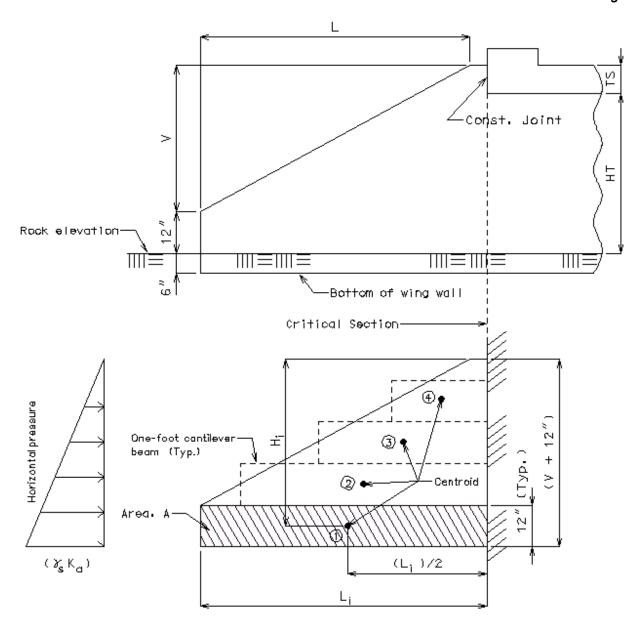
Structural model for designing horizontal reinforcement of wing wall on rock
